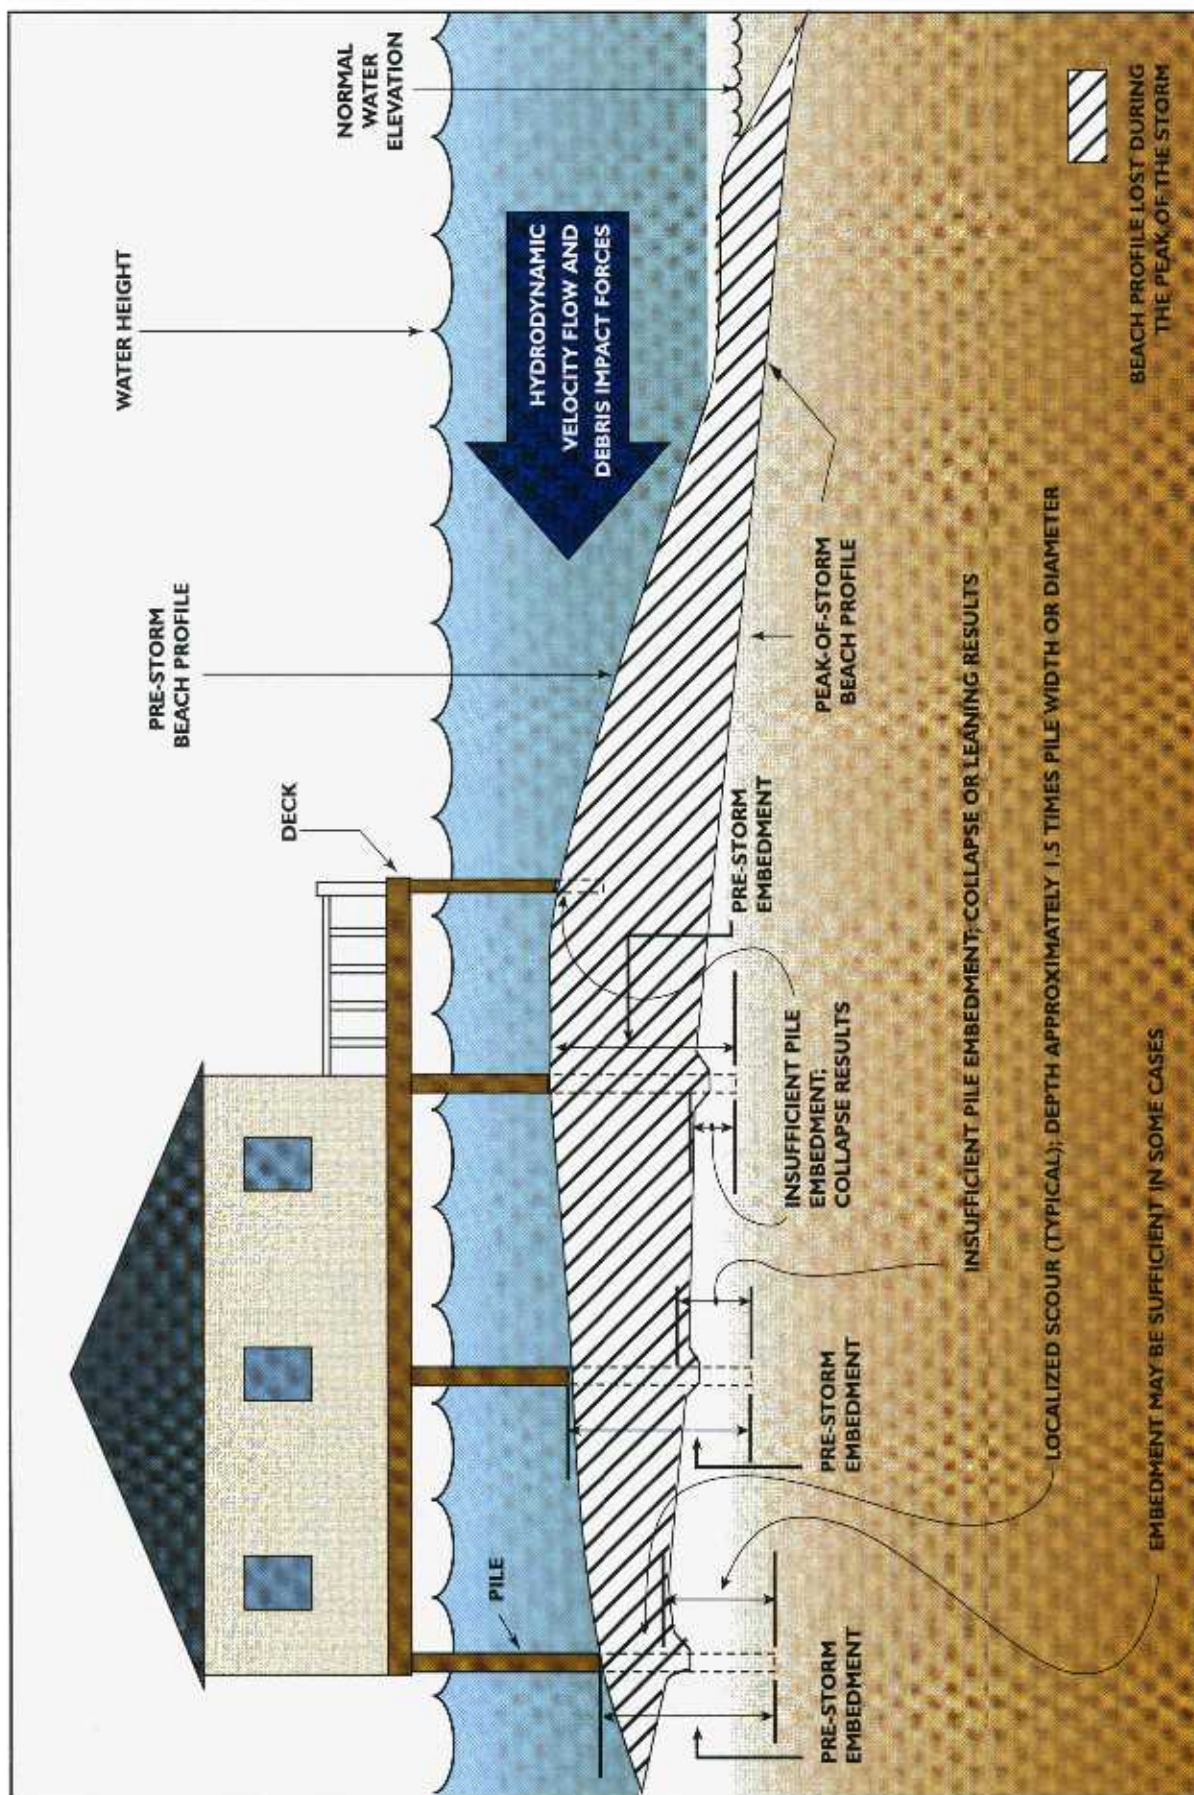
Typical collapse mechanism of post-FIRM buildings due to storm-induced erosion and scour.
